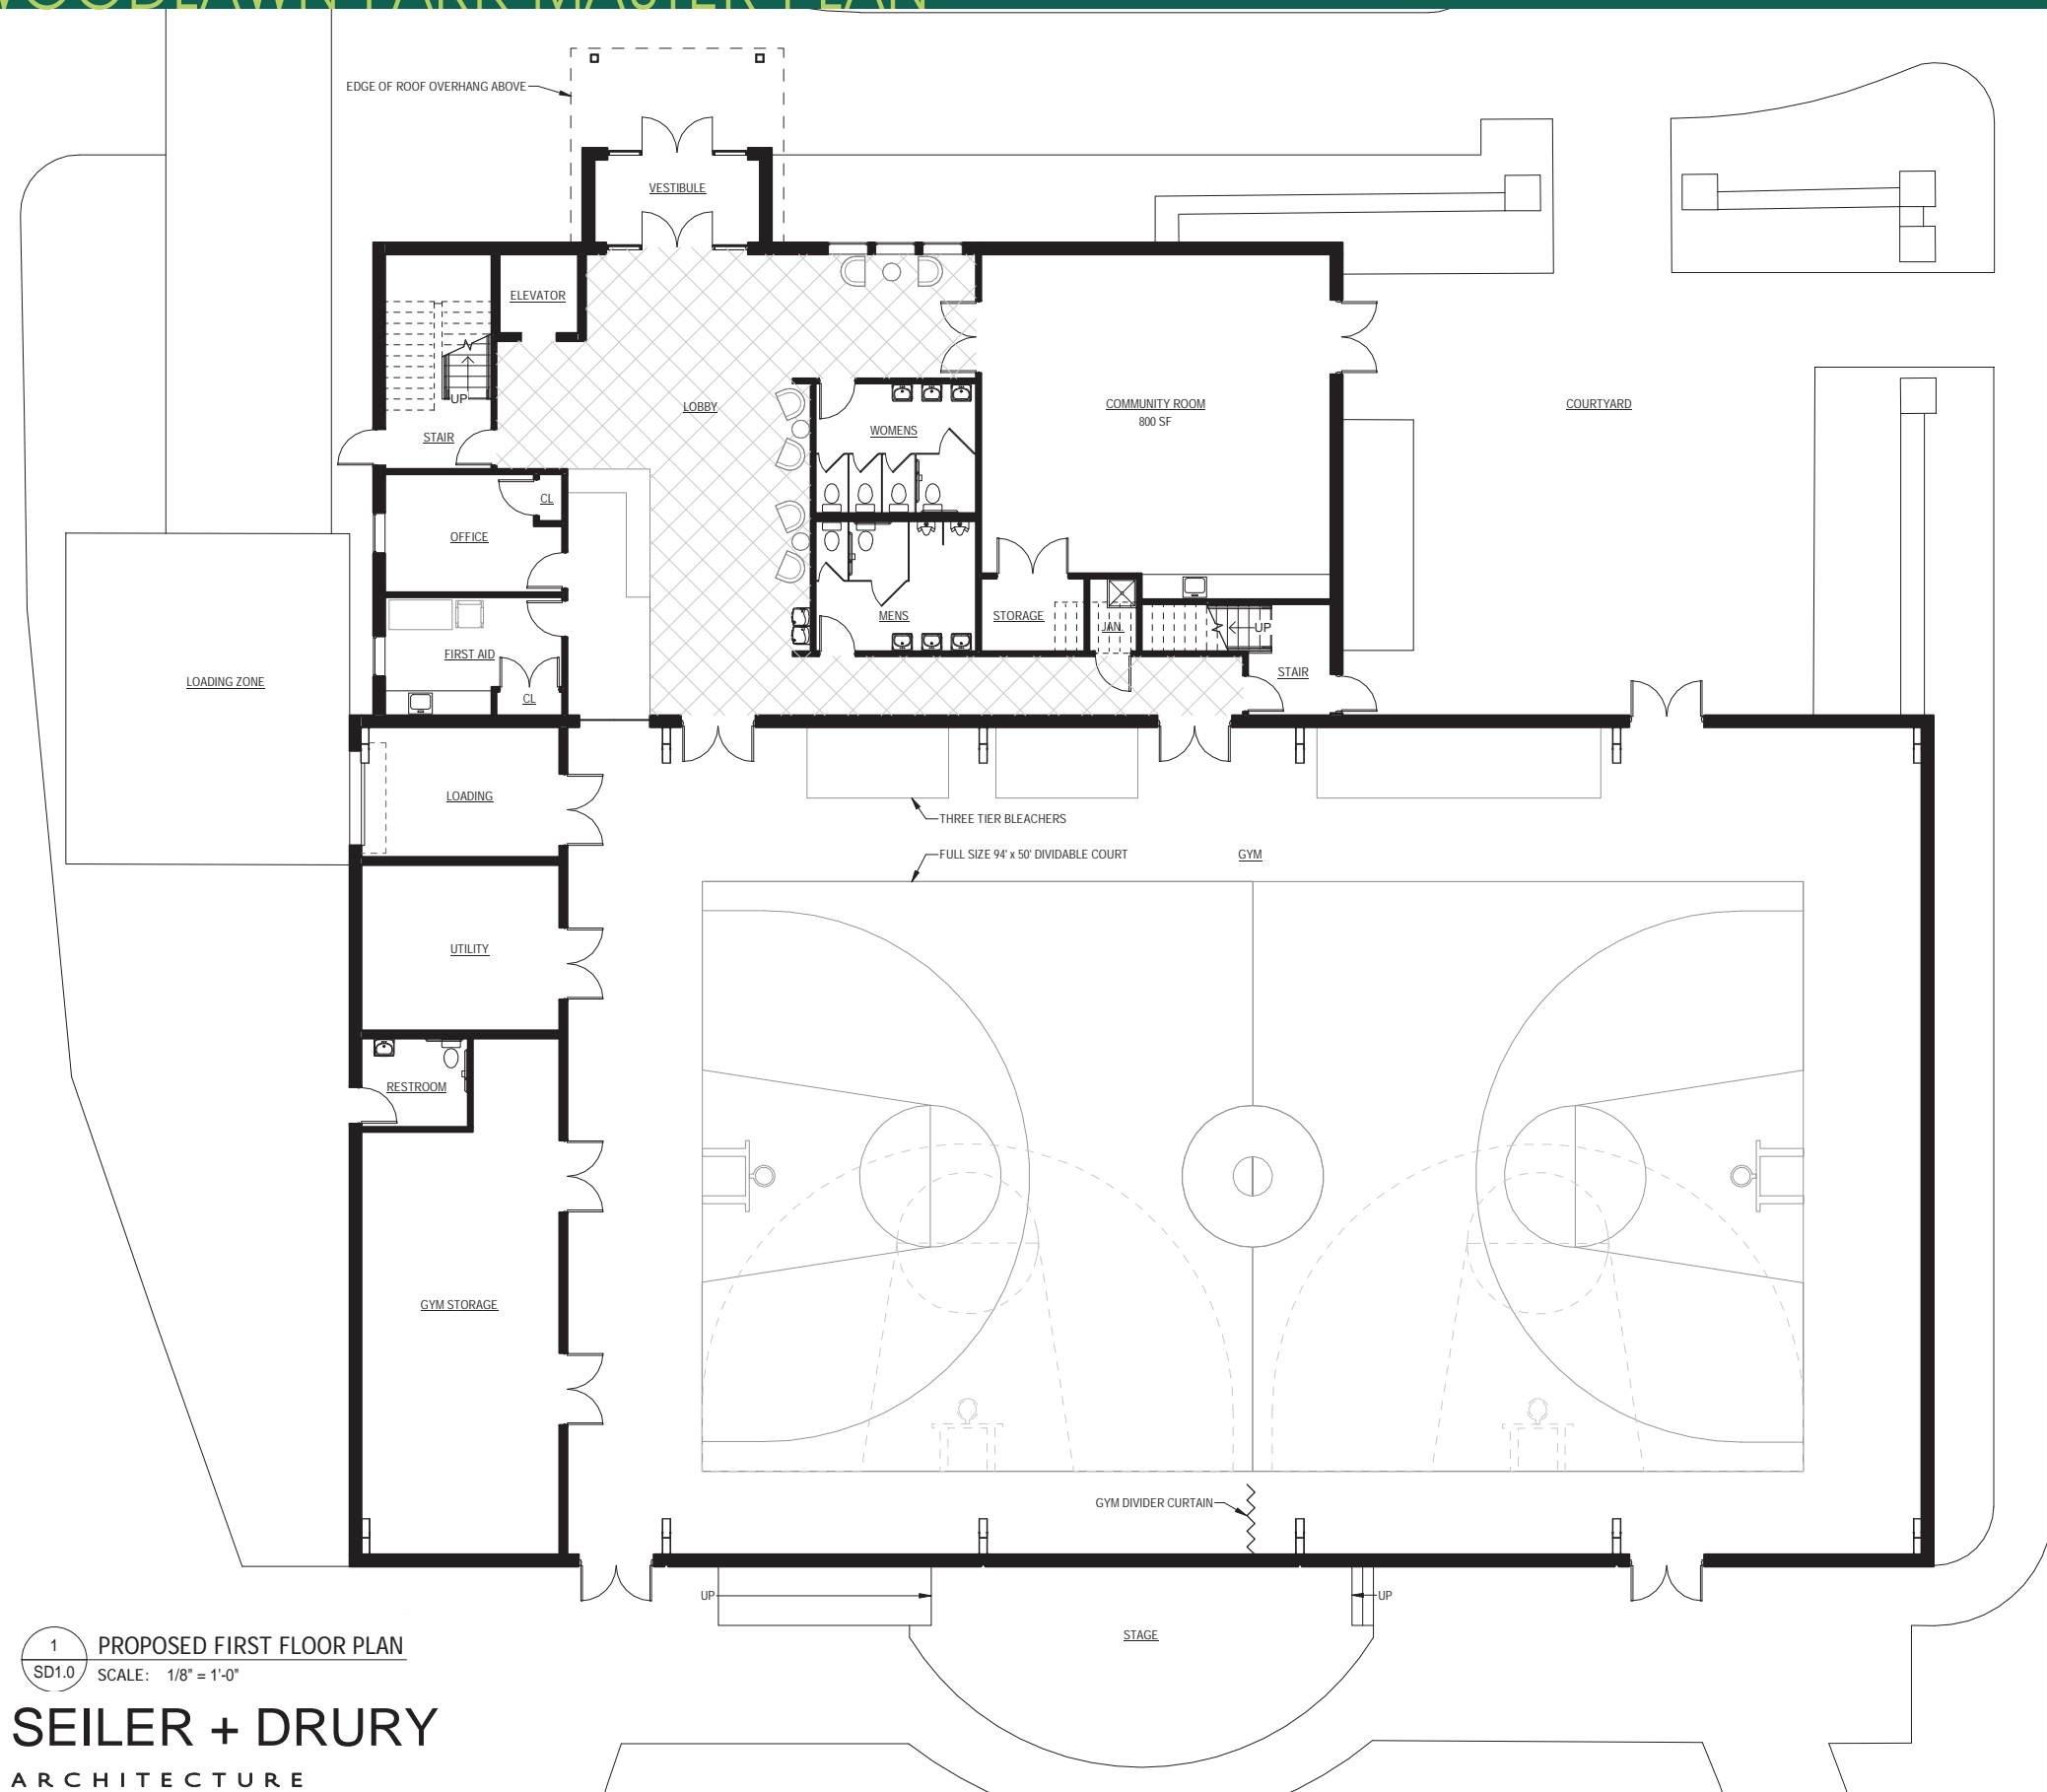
Neighborhood Recreation Building First Floor Footprint
